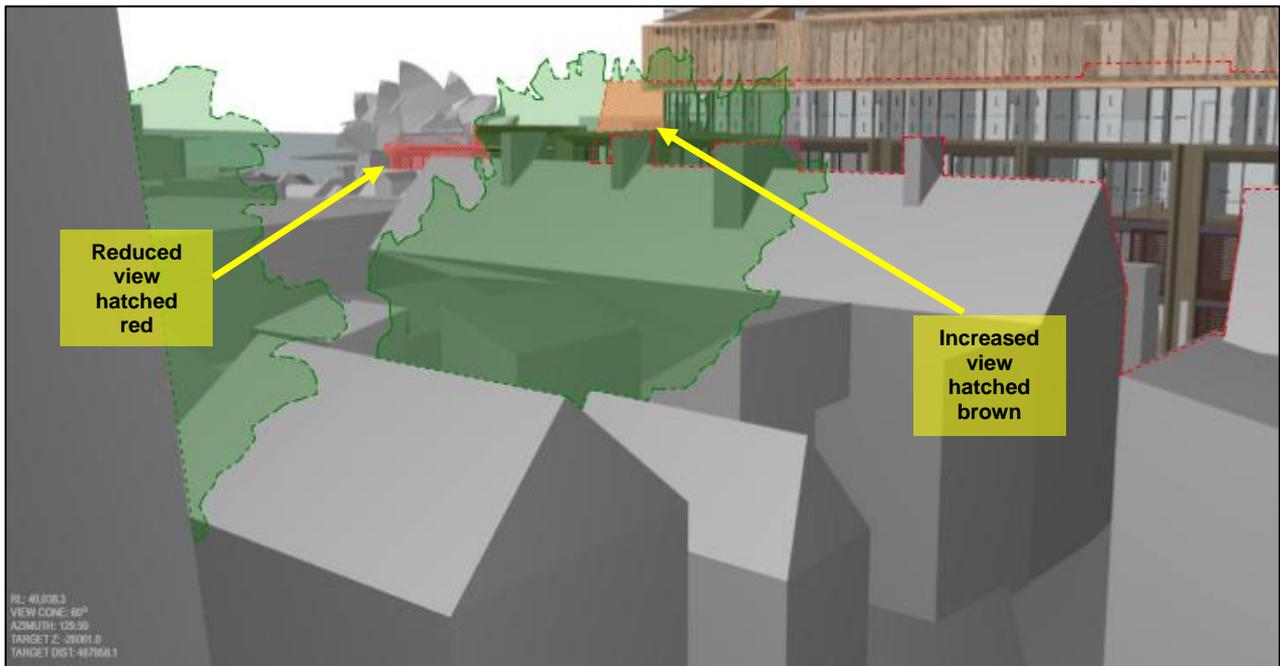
Proposed view from bedroom window in eastern elevation of 140-142 Cumberland Street looking north-east (Source: Applicant's RRTS)
